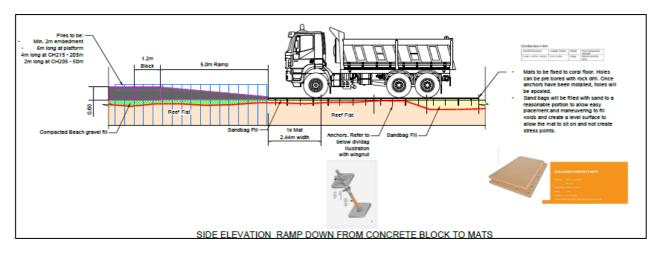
DURA-MATS, Sheet Piles & Concrete Block Causeway Design Details - Side Elevation
